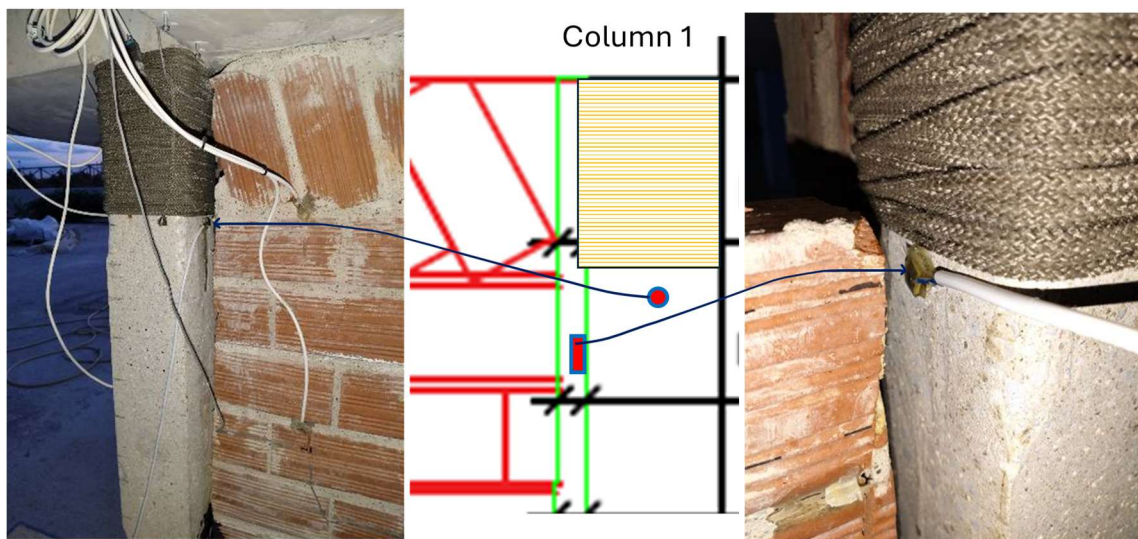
Details of the PZT patches installed at the surface of RC column 1
